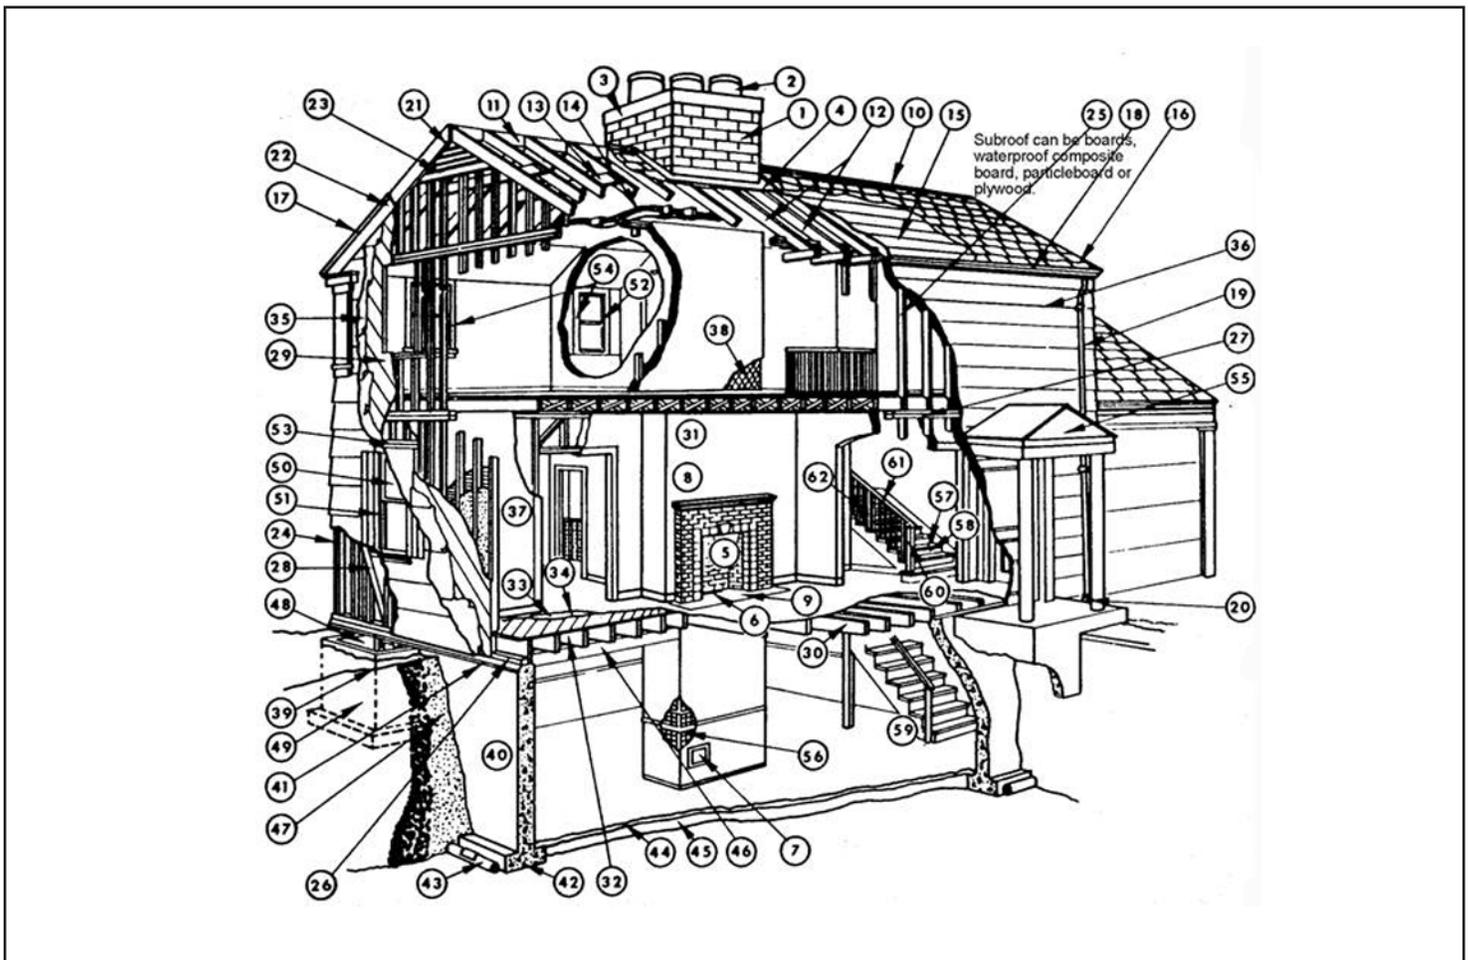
Housing Structure and Terminology, Typical House Built Between 1950 and 1980 [2]
